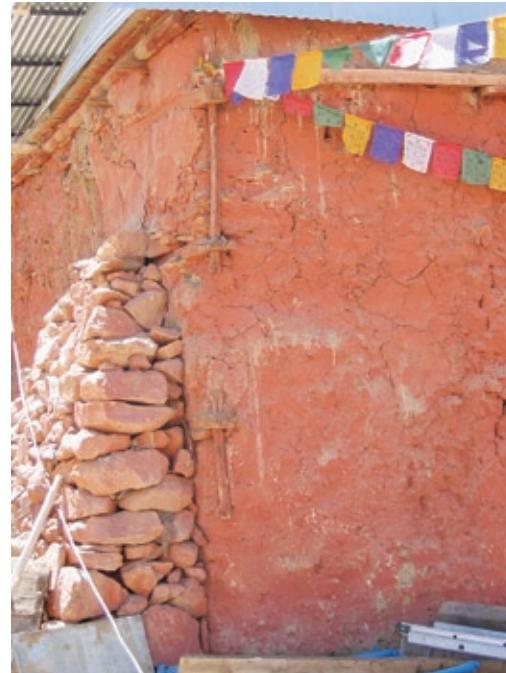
The external surface of the temple at Nako village in upper Kinnaur (AD 1025) is fitted with horizontal wooden wall ties and supporting rubble stone buttresses at the corners.
